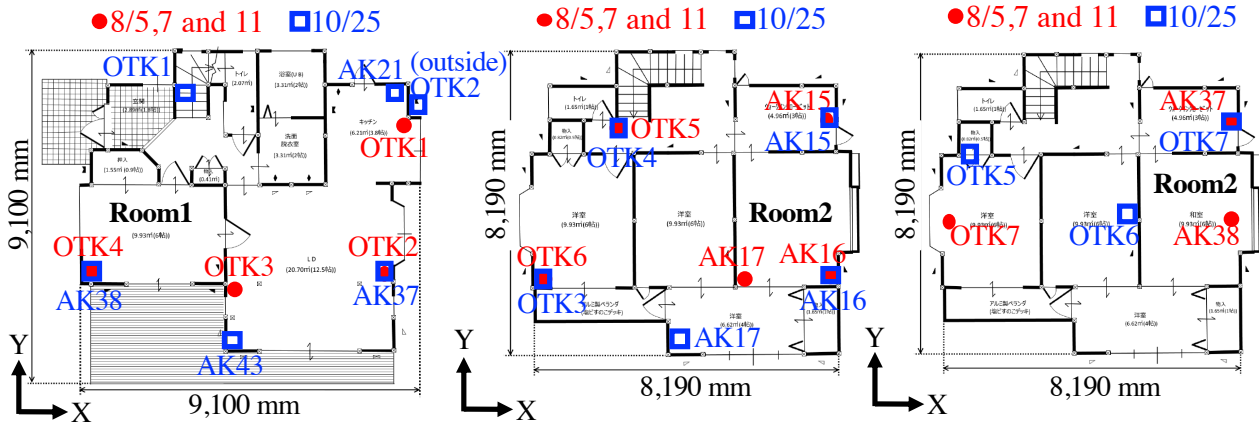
Sensor arrangement for each observation: on the floor of 1F (left), on the floor of 2F (middle) and on the ceiling beam or ceiling floor corresponding to the roof level (right)
